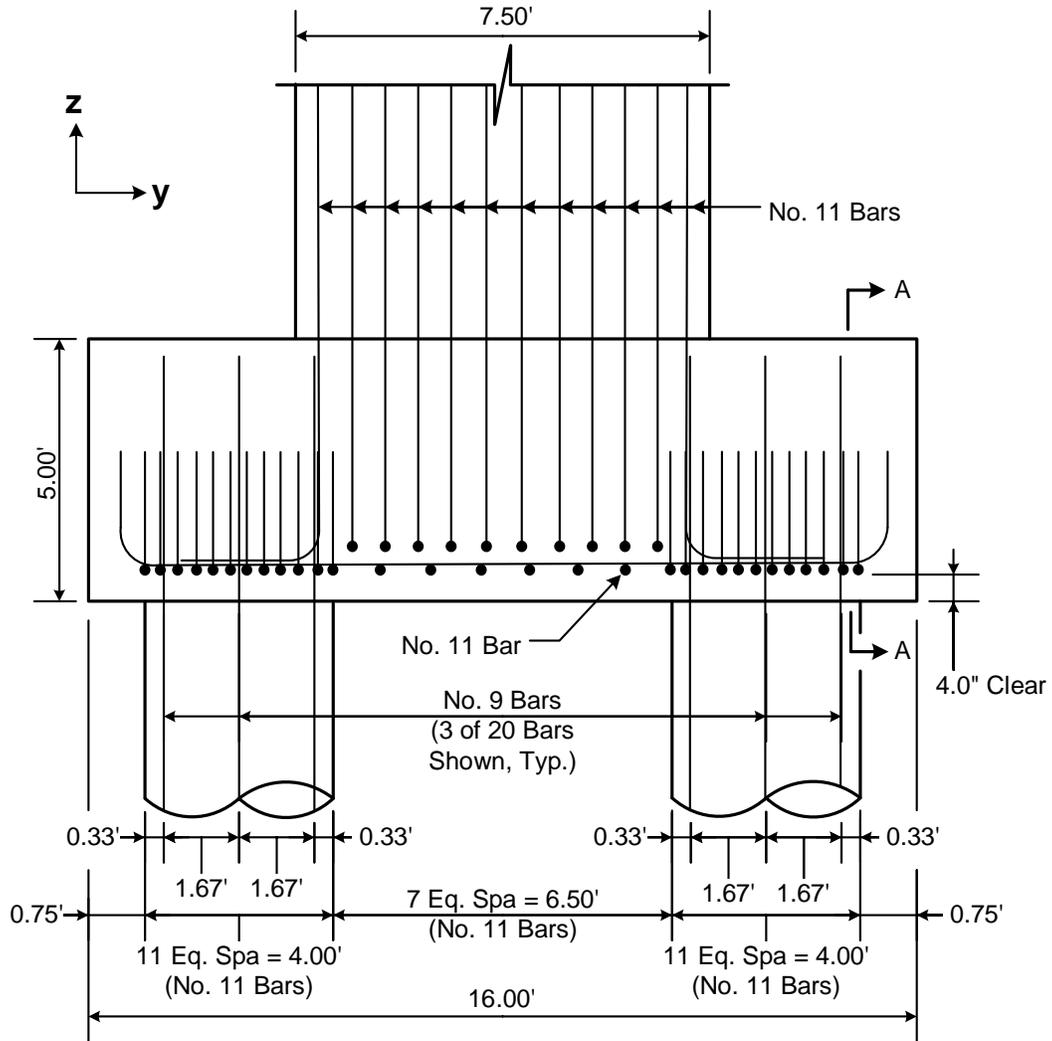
Reinforcement Details 2 - Elevation View of Primary Reinforcement
